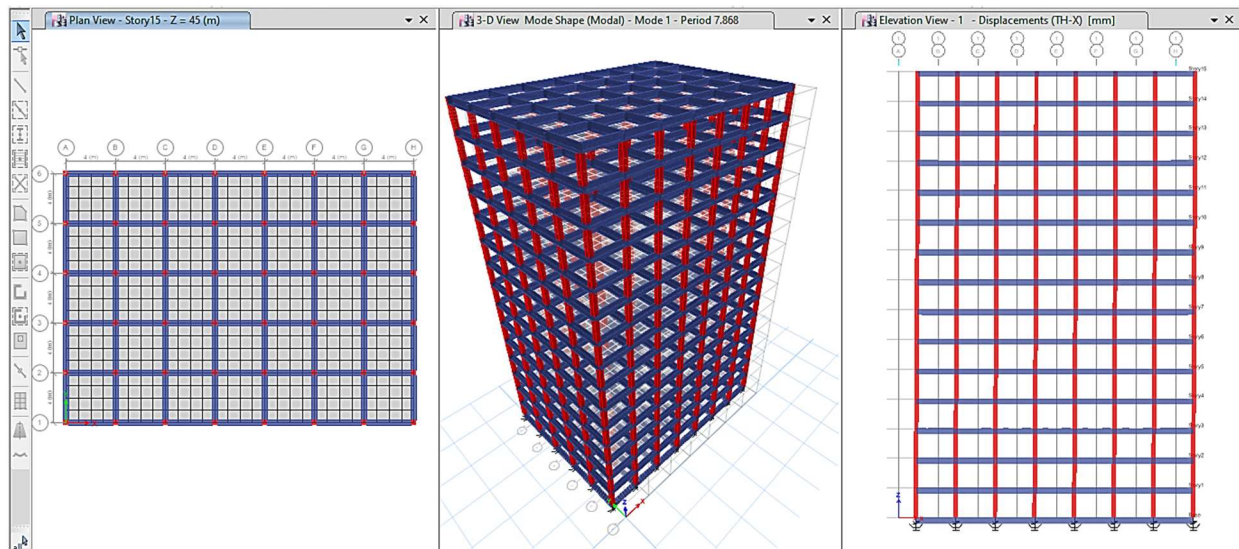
Plan, 3D & Elevation view of FPS base rectangular plan building
